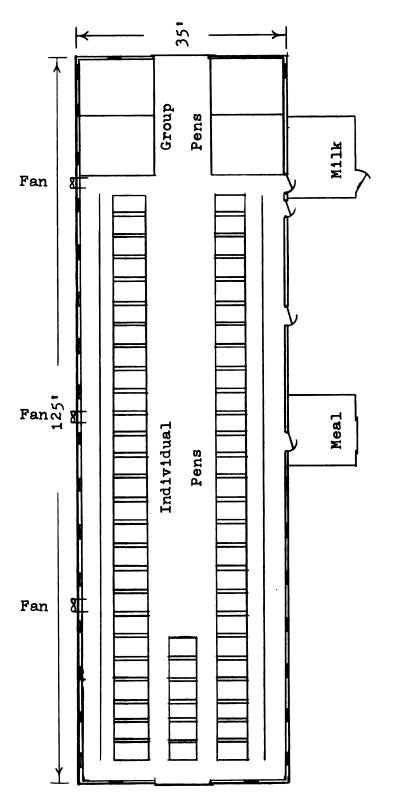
Layout of House B Showing Individual and Group Pens, and Fan
